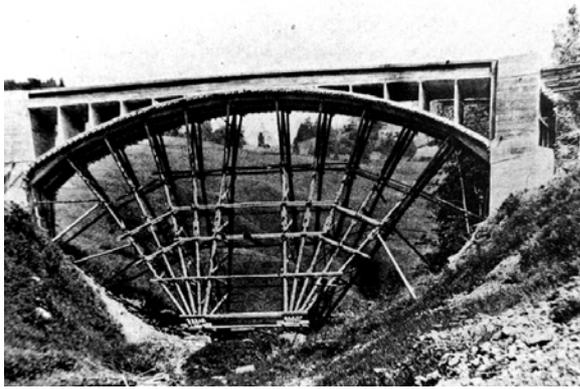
Flienglibach Bridge, first deck stiffened arch built by Robert Maillart, 1923. (Billington¹)
